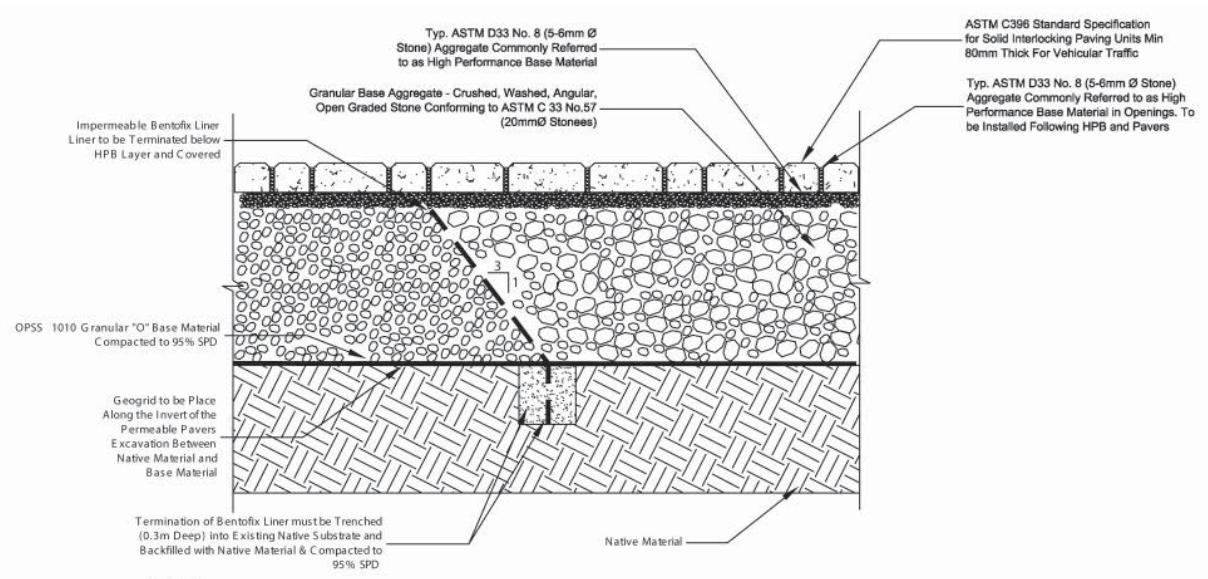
A cross-section detail from the construction plan used at the IMAX Project site. (Source: Aquafor Beech)
